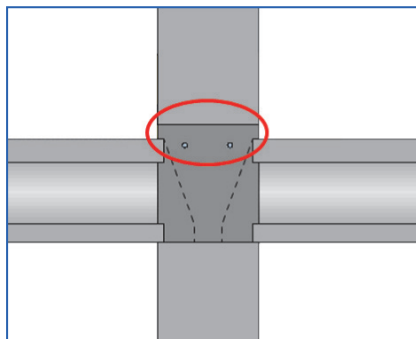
Leaks at element joints (insufficient grouting) as an example of a typical error when using concrete elements.
